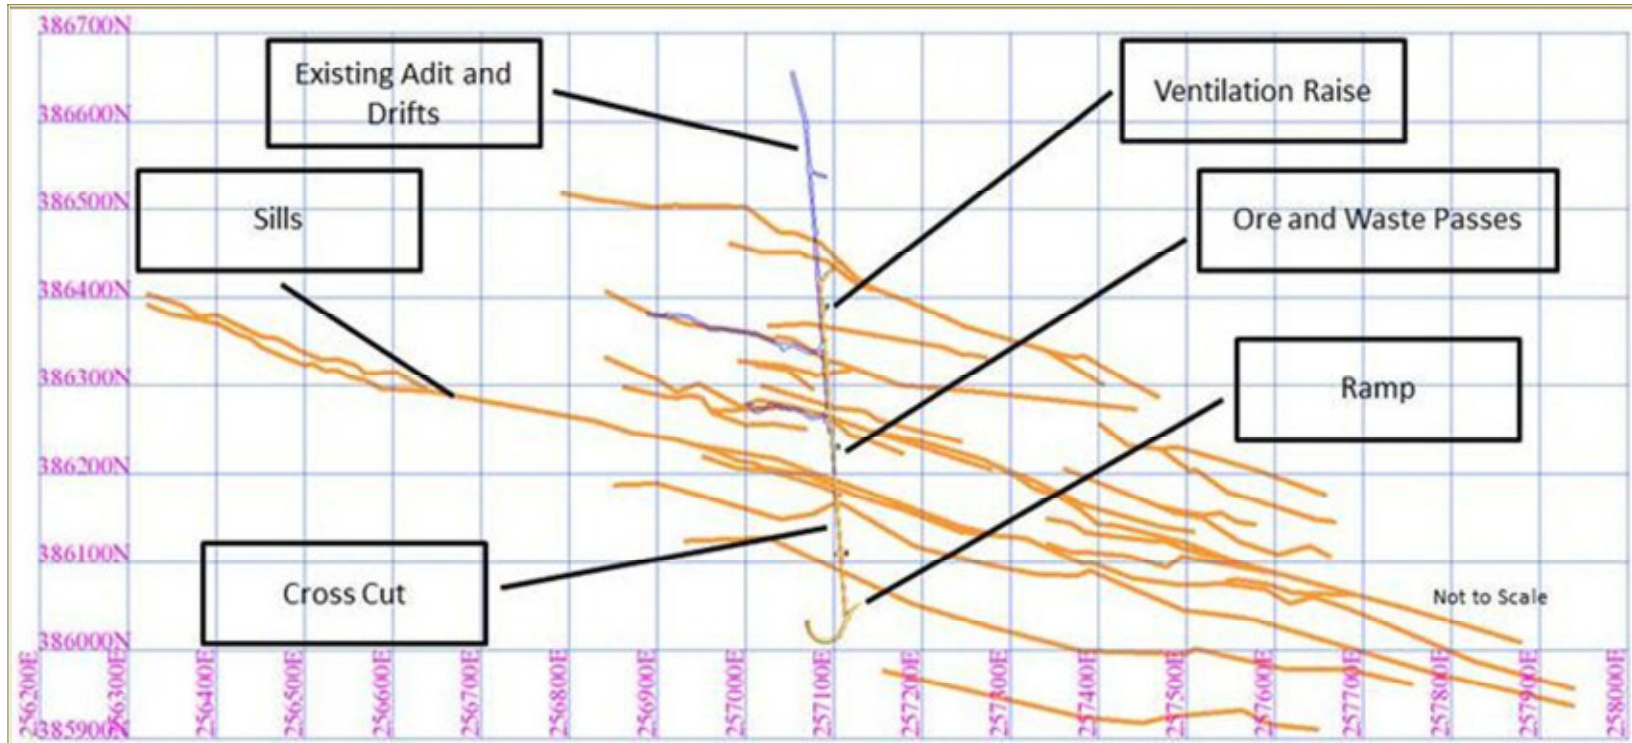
Typical Plan View of the Mine Layout (at 180 m Elevation)
